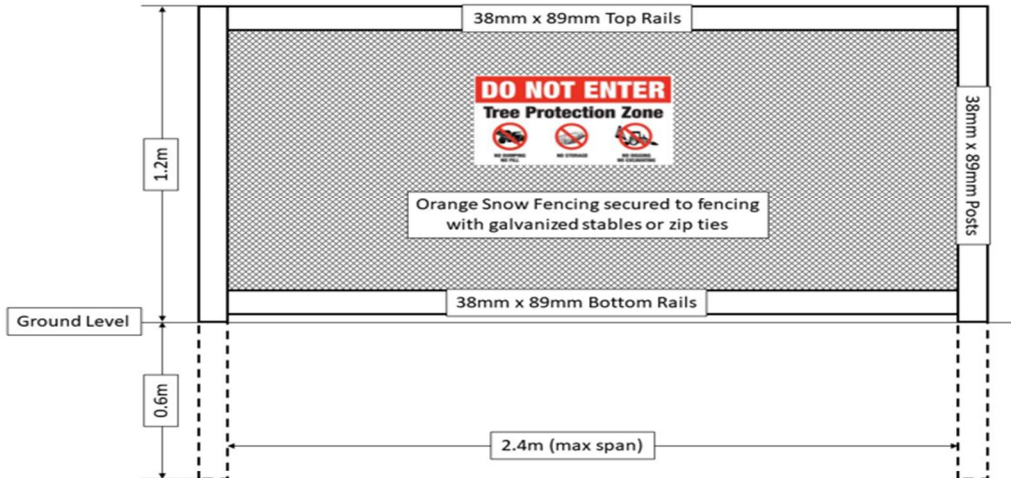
Tree Protection Fencing. In rocky areas, metal (t-posts or rebar) drilled into rock will be accepted instead of wooden posts.
